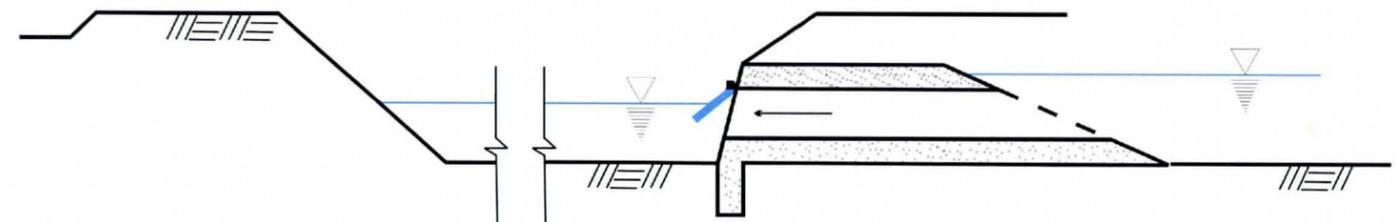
With lower levels in the EMF, pressure from behind opens the outlet flap gates and the basin continues to drain through the outlet.
